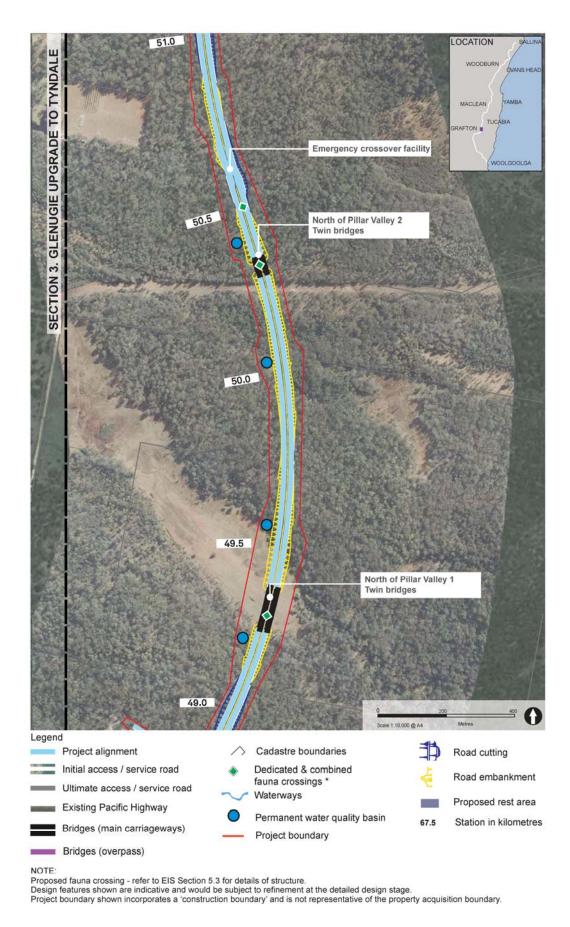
The project - Section 3 (Station 49.0 to 51.0)
